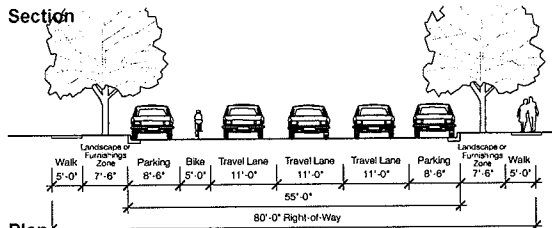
(k)-1: Typical Sample One Way Boulevard - 6th Street & Portions of 1st Street
